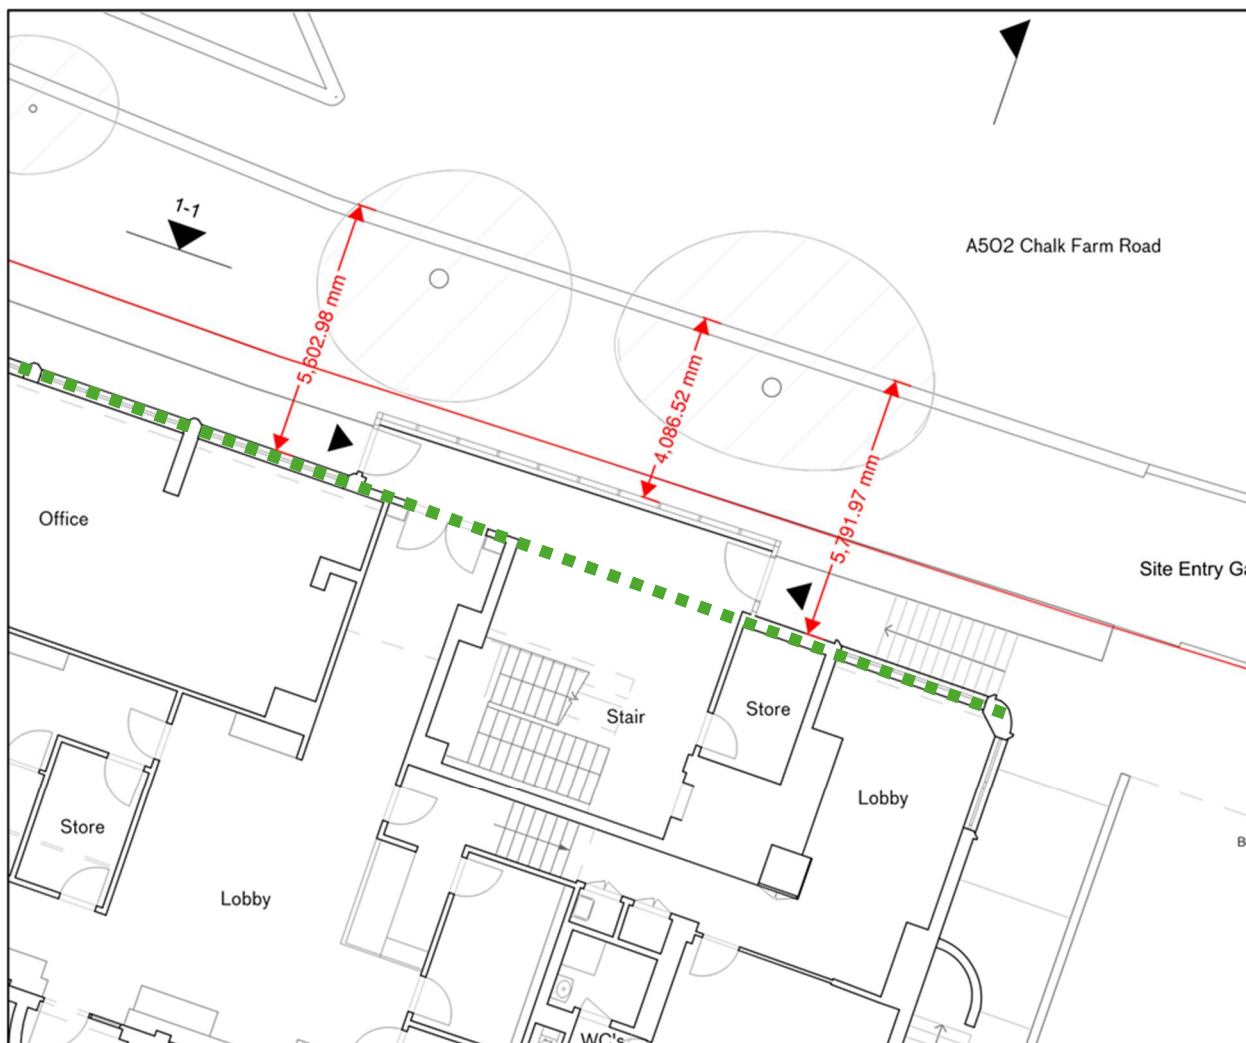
Site plan showing approximate distance of existing 100 CFR building piling line (green) to line of TfL external tunnel face
